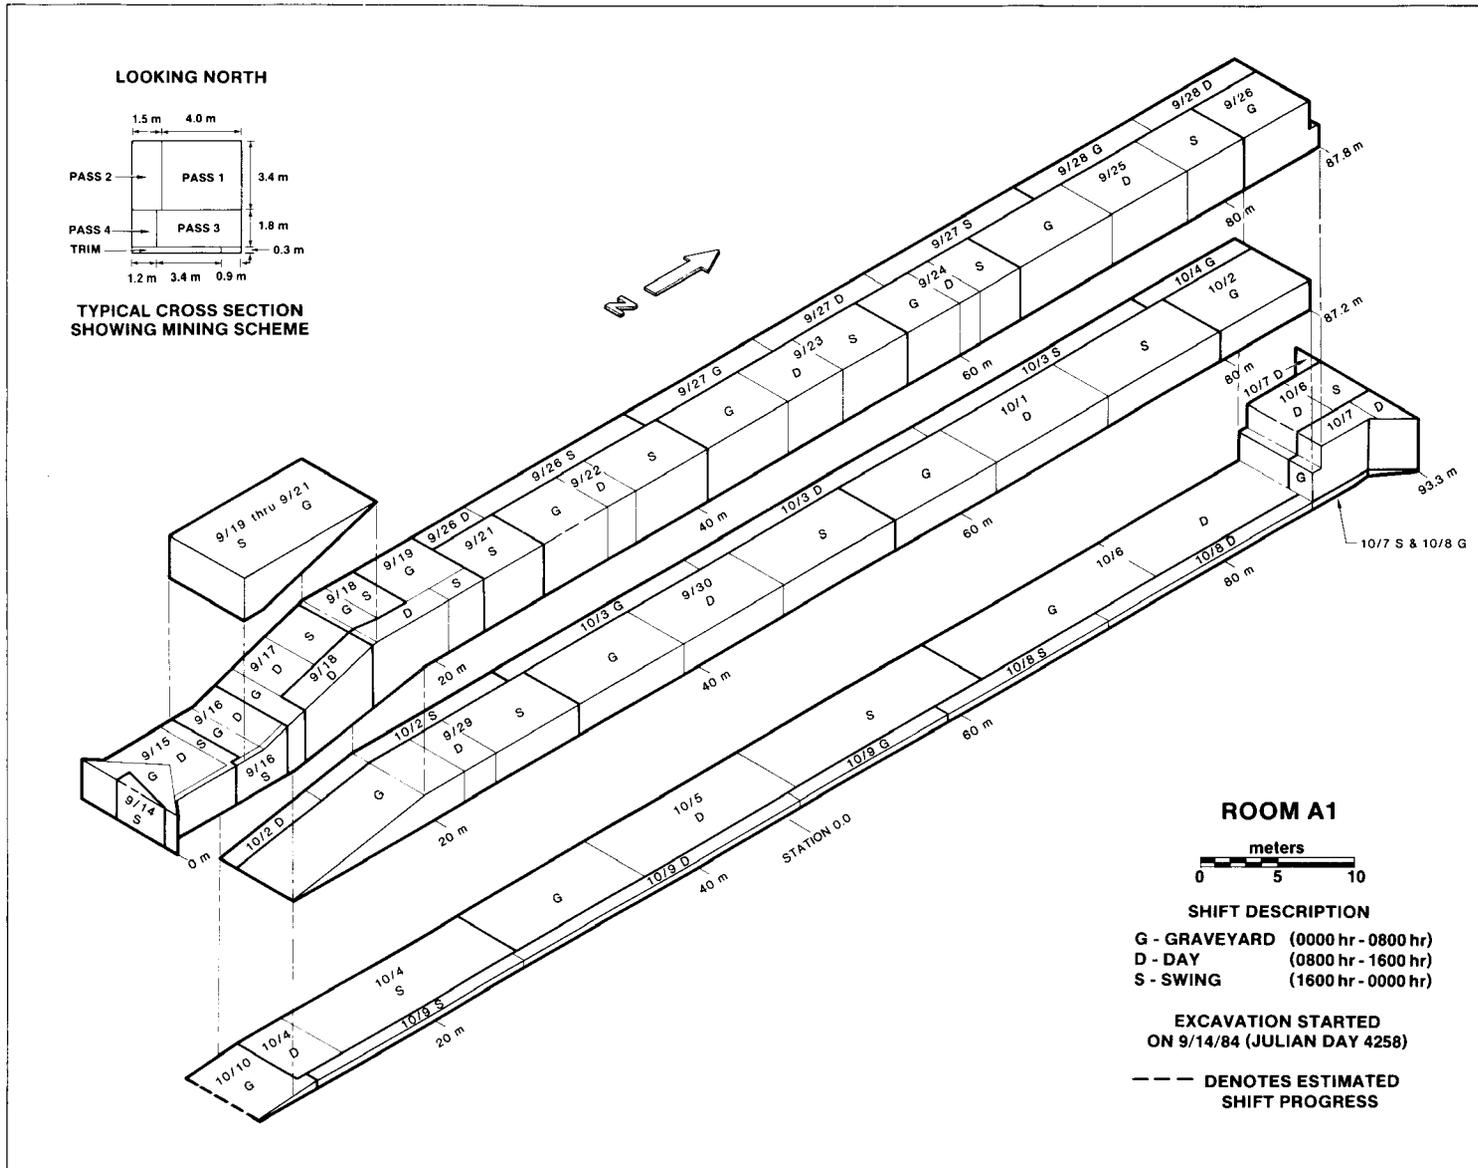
Isometric of Multipass Mining of Room A1
